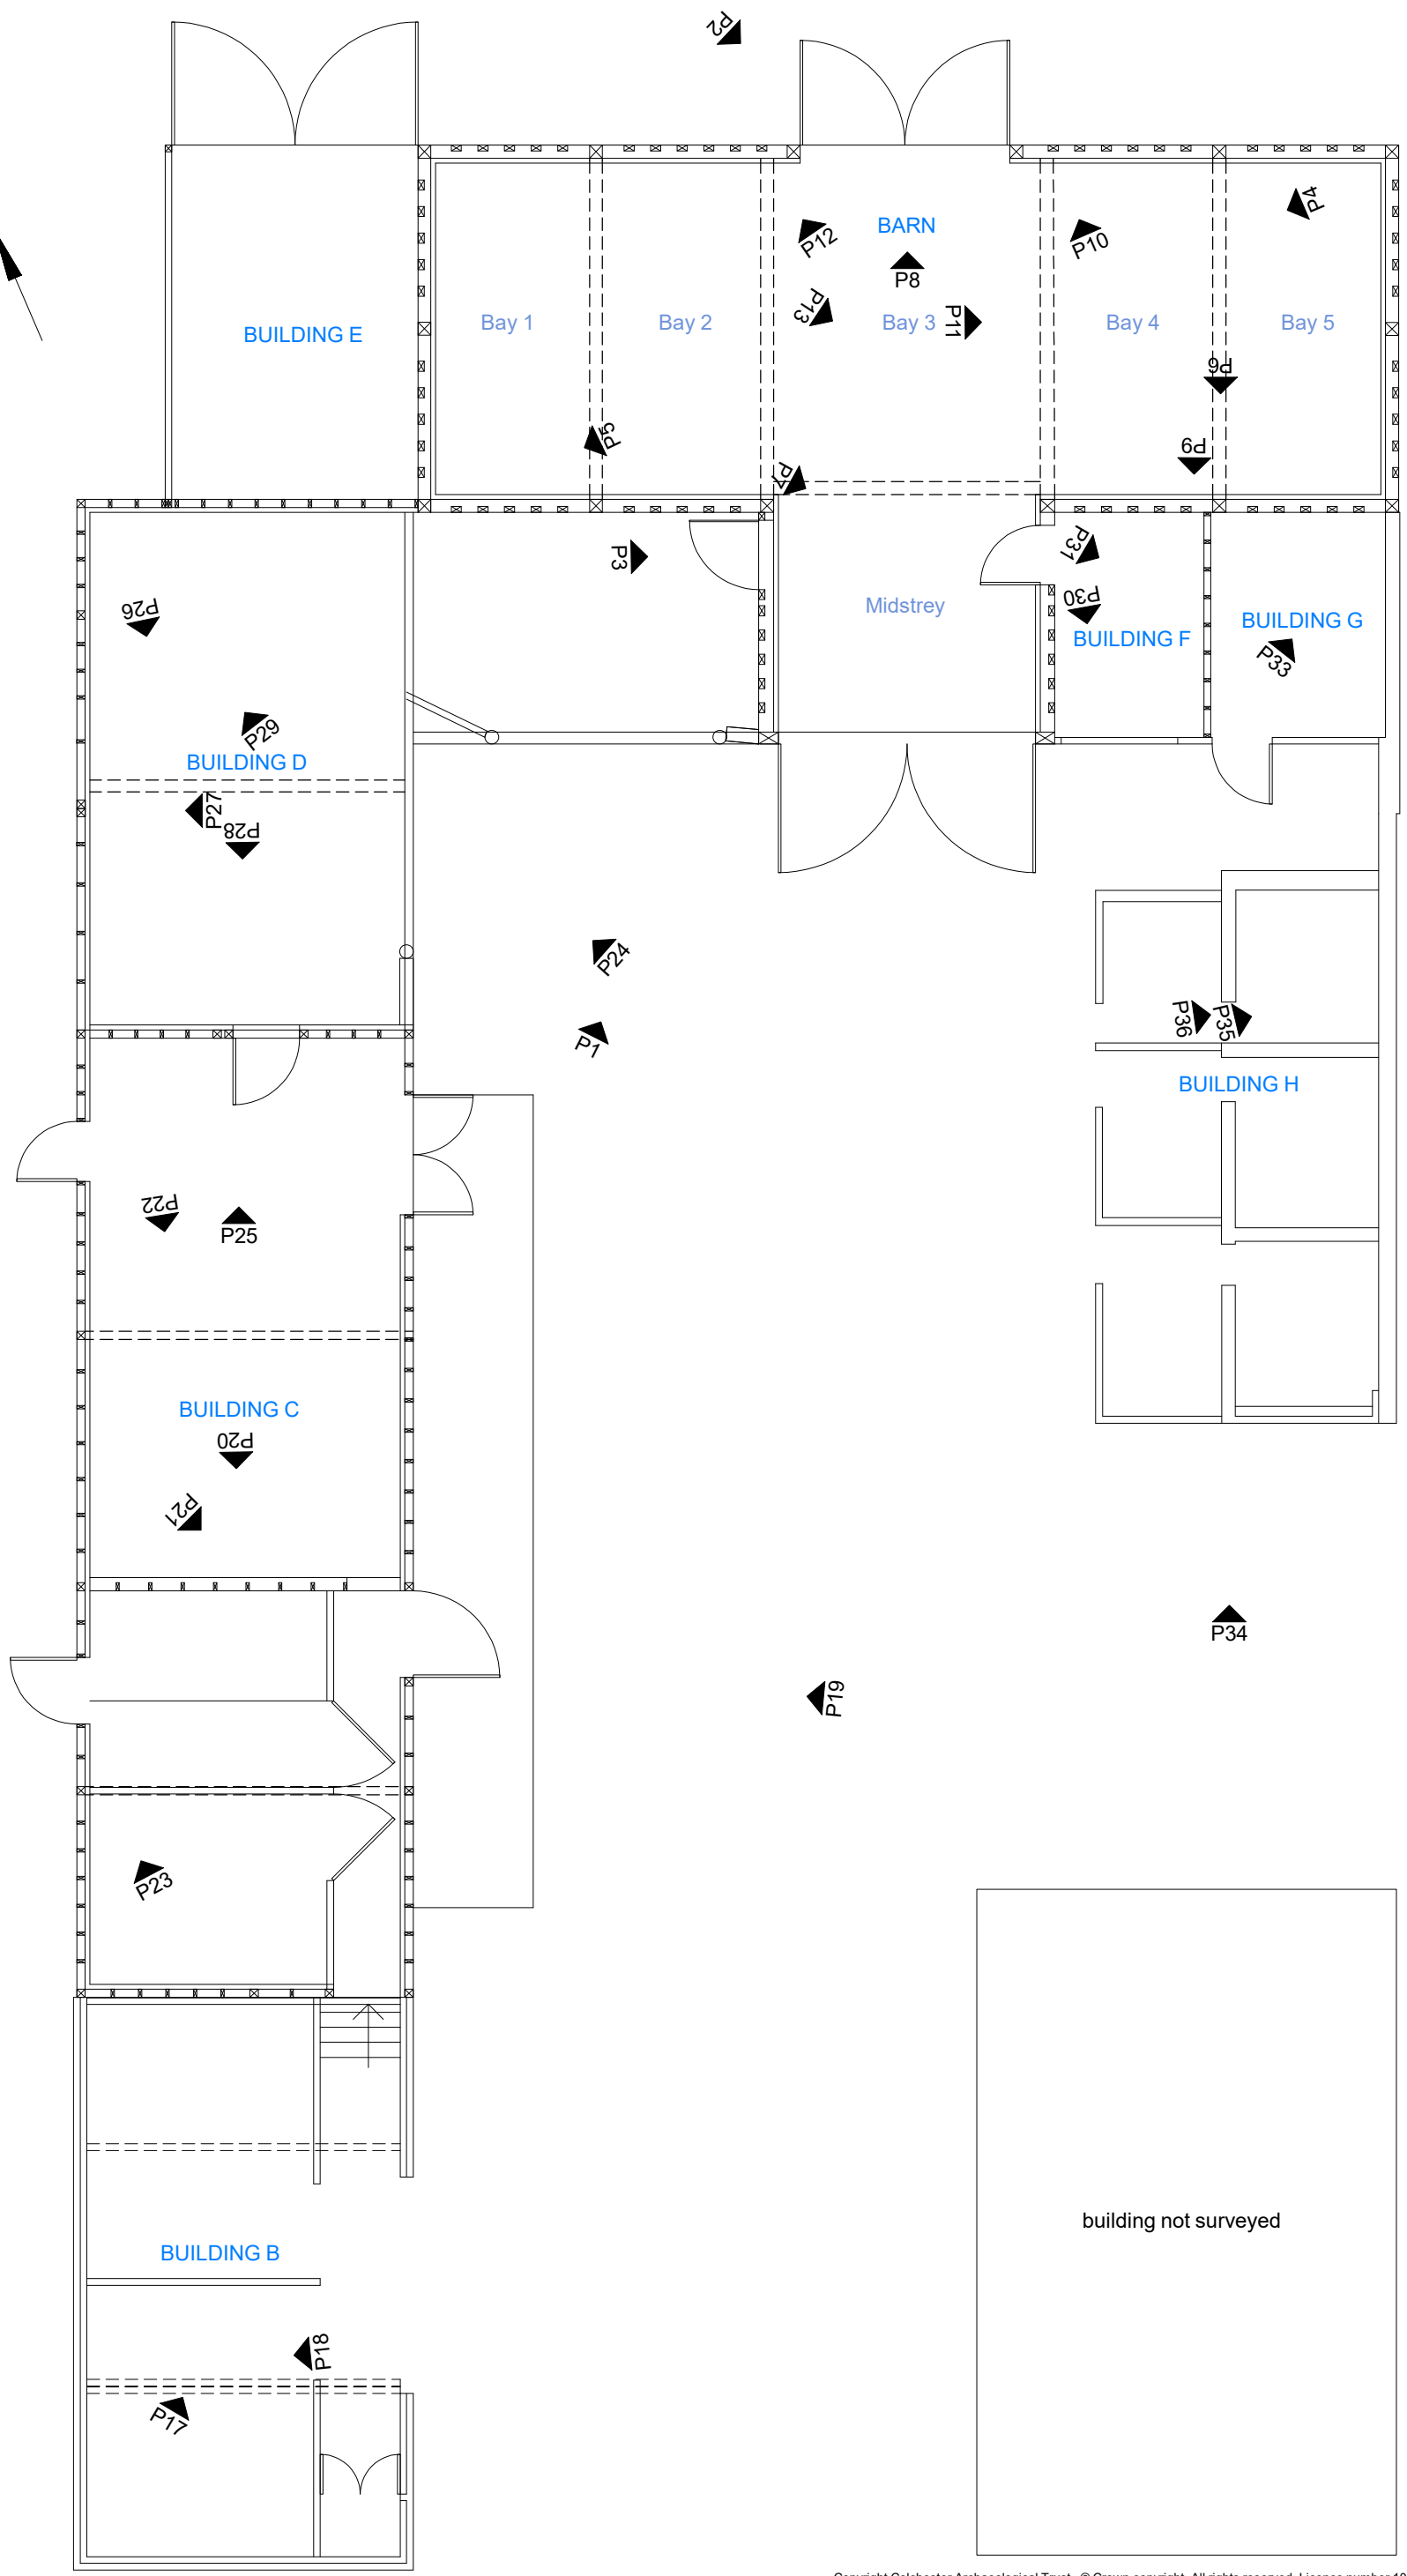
Detailed plan of barn and Buildings B-H. Arrows show location and direction of photographs reproduced in the text.
